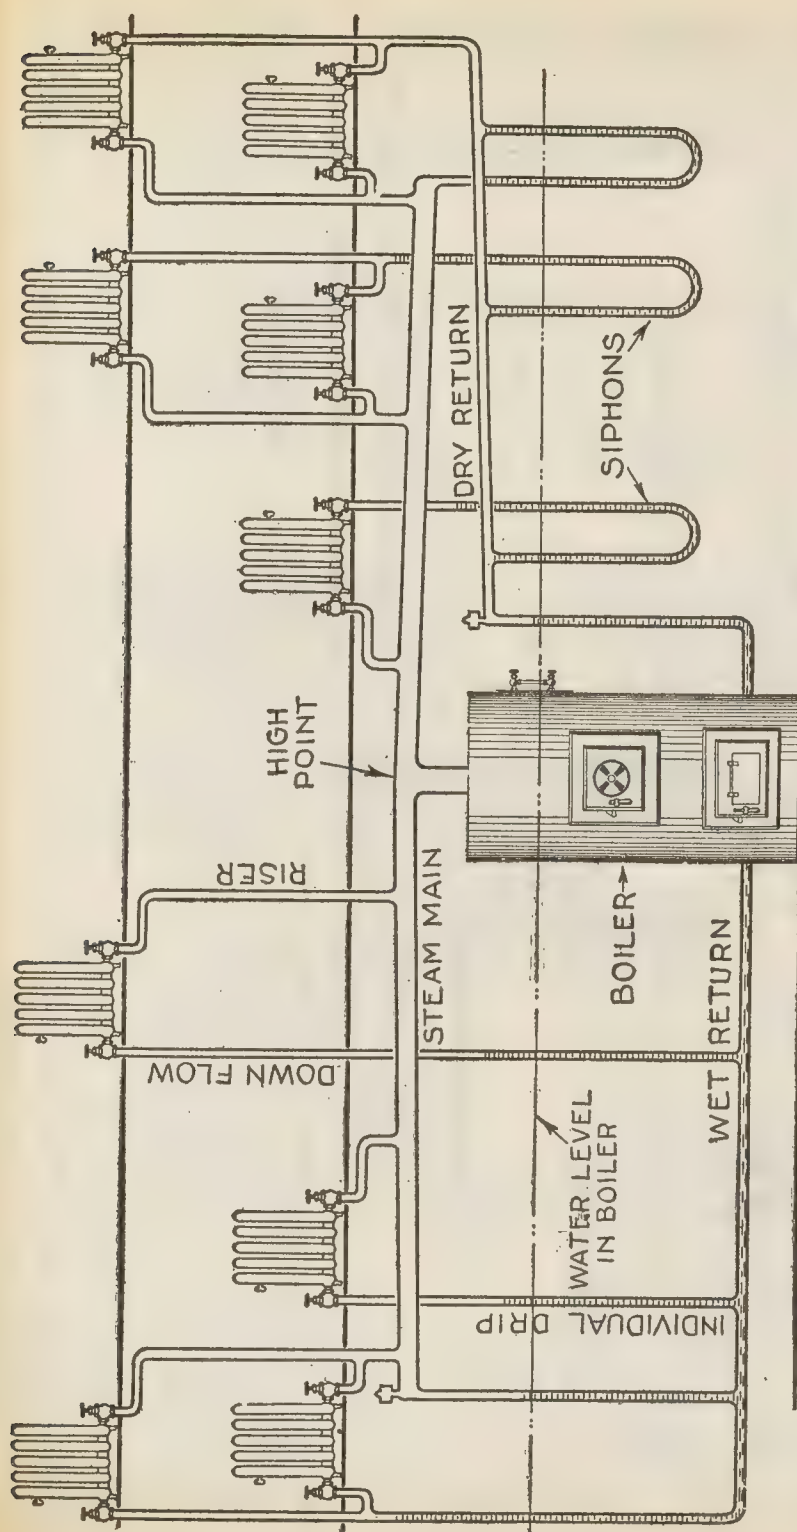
,437.—Two pipe system. Steam and return mains are employed the same as with the one pipe system. Various piping arrangements are used for these, such as circuit, divided circuit, loop, etc., as will best meet the requirements of the buildings. Dry or wet returns may be used. Steam is supplied to the radiators through risers and the condensation returned through down flow or drip pipes, as shown. Smaller pipes for both risers and down flows are used than in the one pipe system, the cost notwithstanding is greater than for the pipe system, hence the popularity of the latter.
